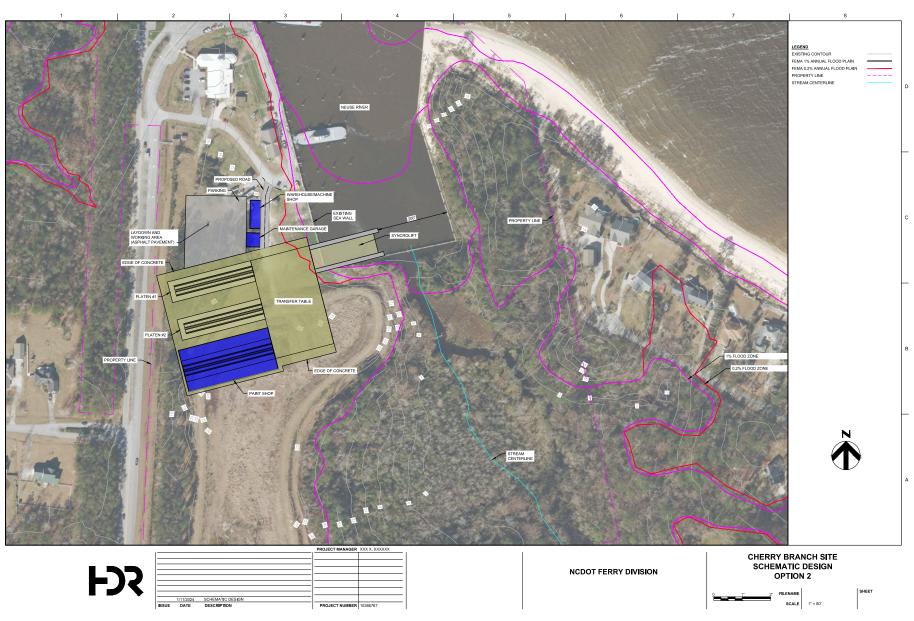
Conceptual Plan for New Maintenance Facility at Cherry Branch Site
